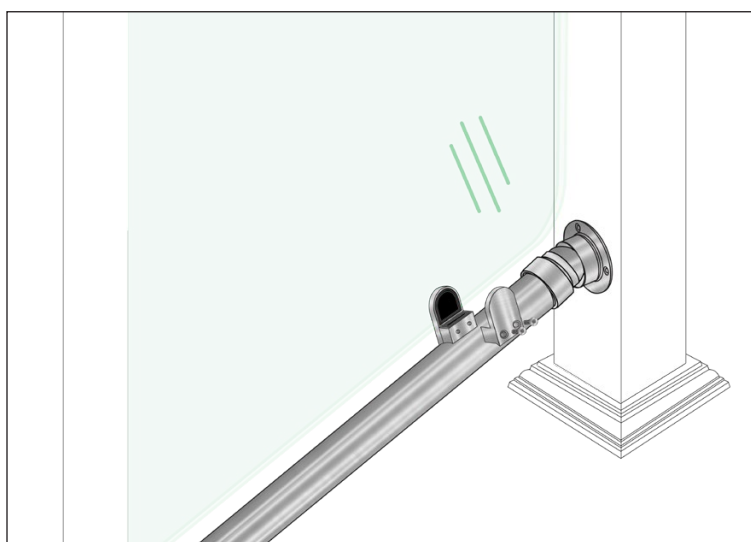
Figure K. Remove the side of each Glass Panel Connector and install glass infill between neoprene pads and center. Re-attach Glass Panel Connector sides.
